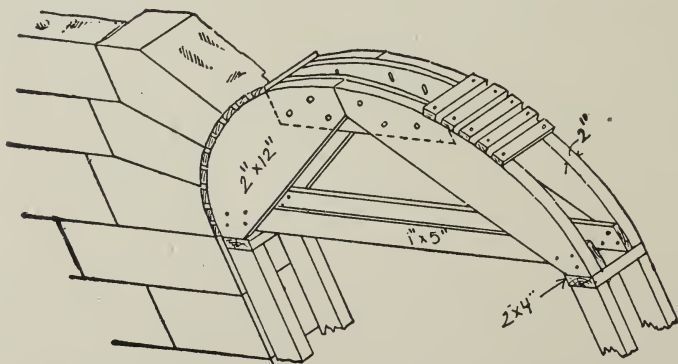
Wooden Center for Stone Arch. Usual Construction.
